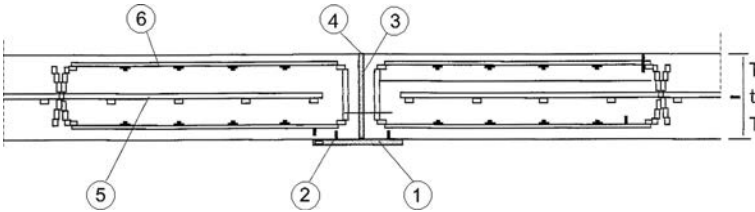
Modified design of face slab joint at central compression zone, Kárahnjúkar Dam (after Perez et al., 2007). (1) Mortar pad; (2) copper waterstop (3) filler; (4) no V notch; (5) central rebar; (6) anti-spalling rebar.
